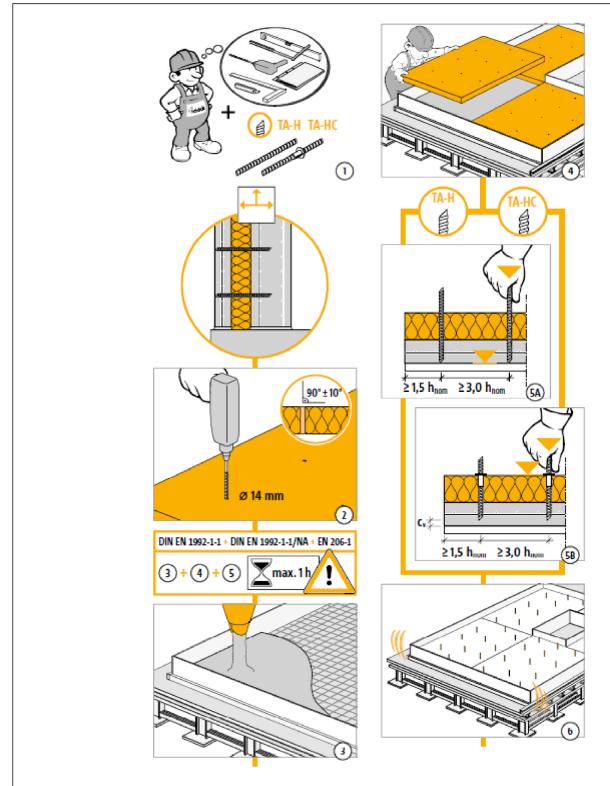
Installation instruction - Schöck Isolink® for sandwich wall - page 1
